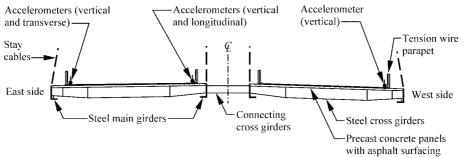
Typical cross section of deck showing arrangement of accelerometers
